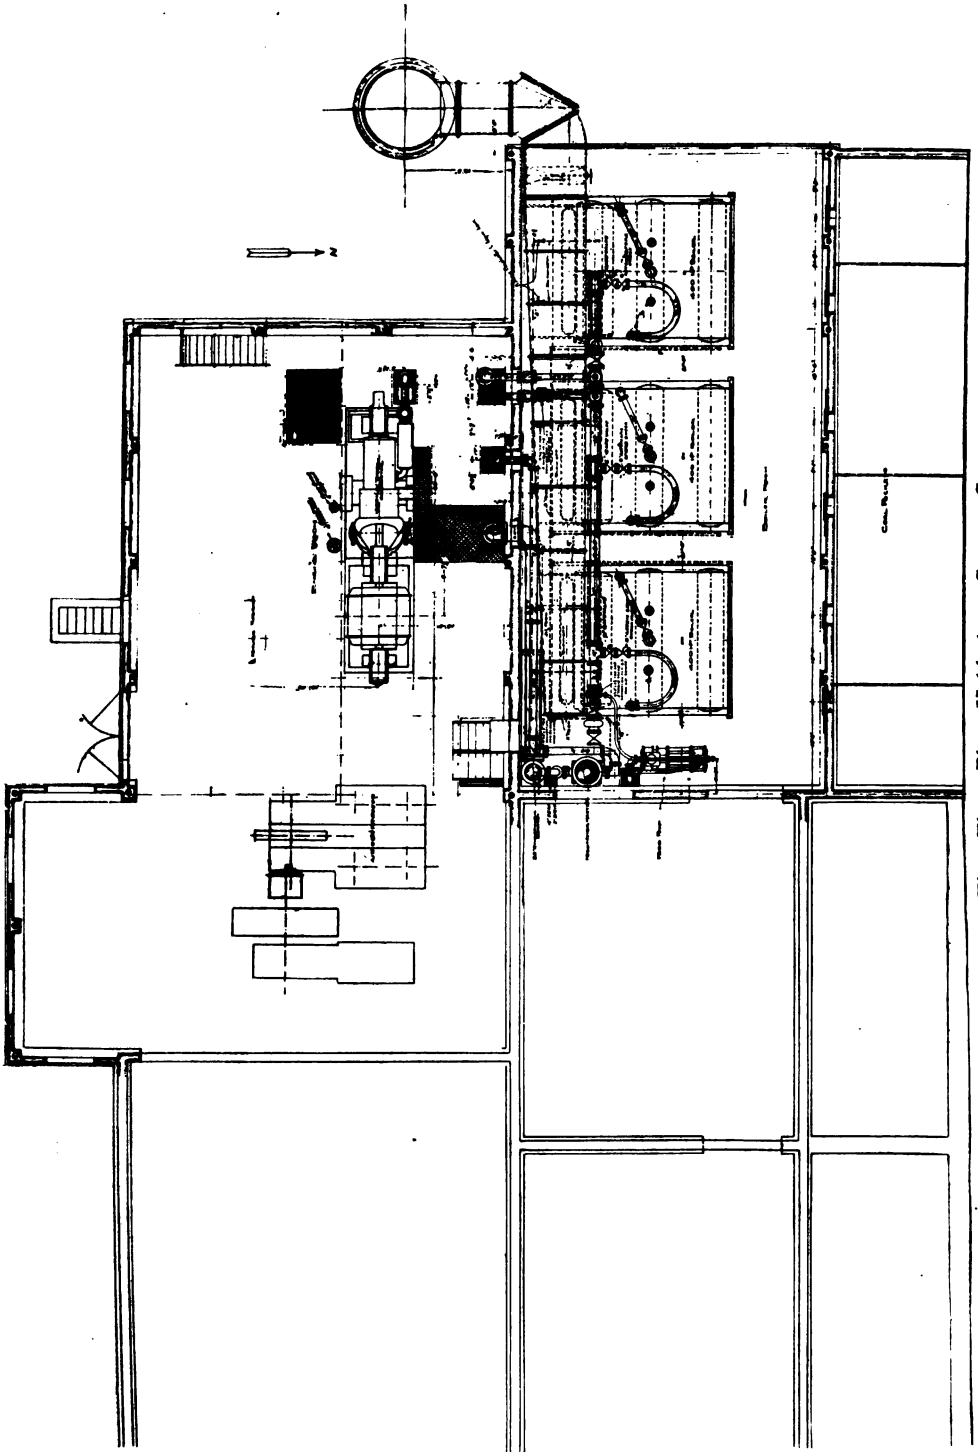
First Floor Plan, Helderberg Cement Co.
